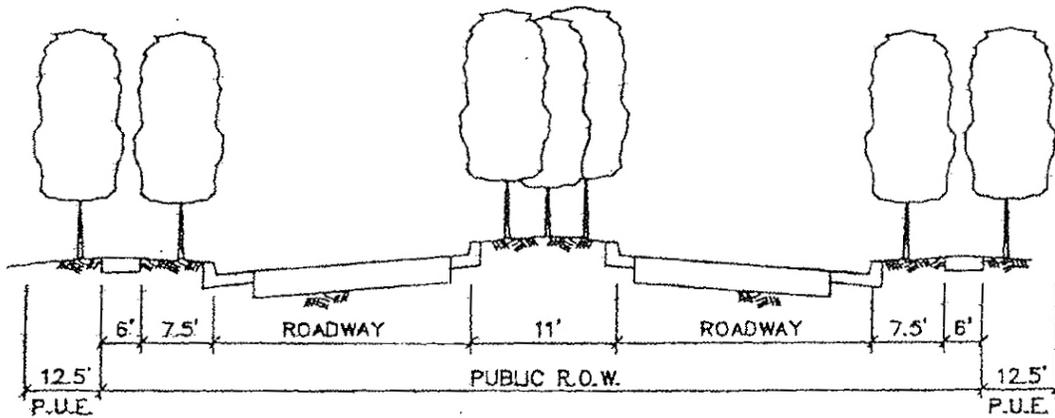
Natomas Crossing Drive Streetscape Plan
